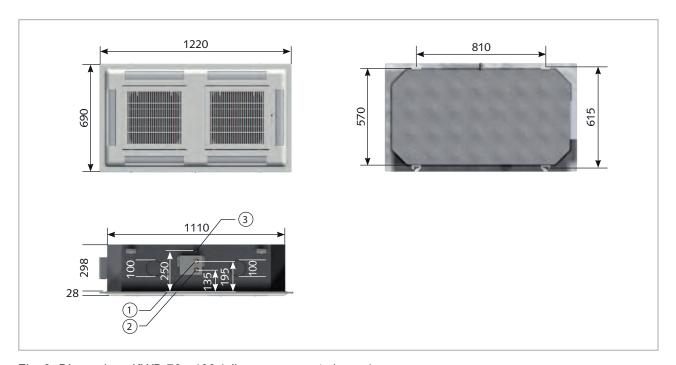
Dimensions KWD 70 - 100 (all measurements in mm)
